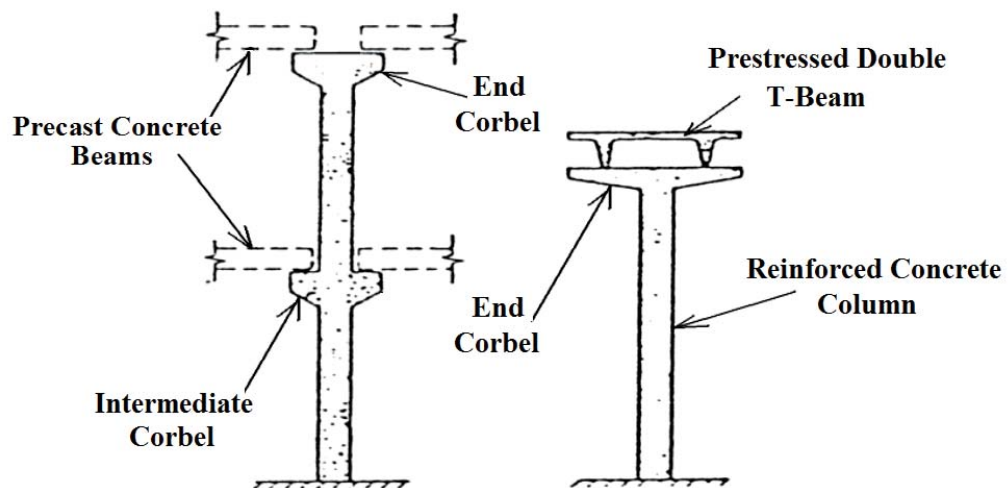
Precast concrete column and corbels, (Salman, et al., 2014)
